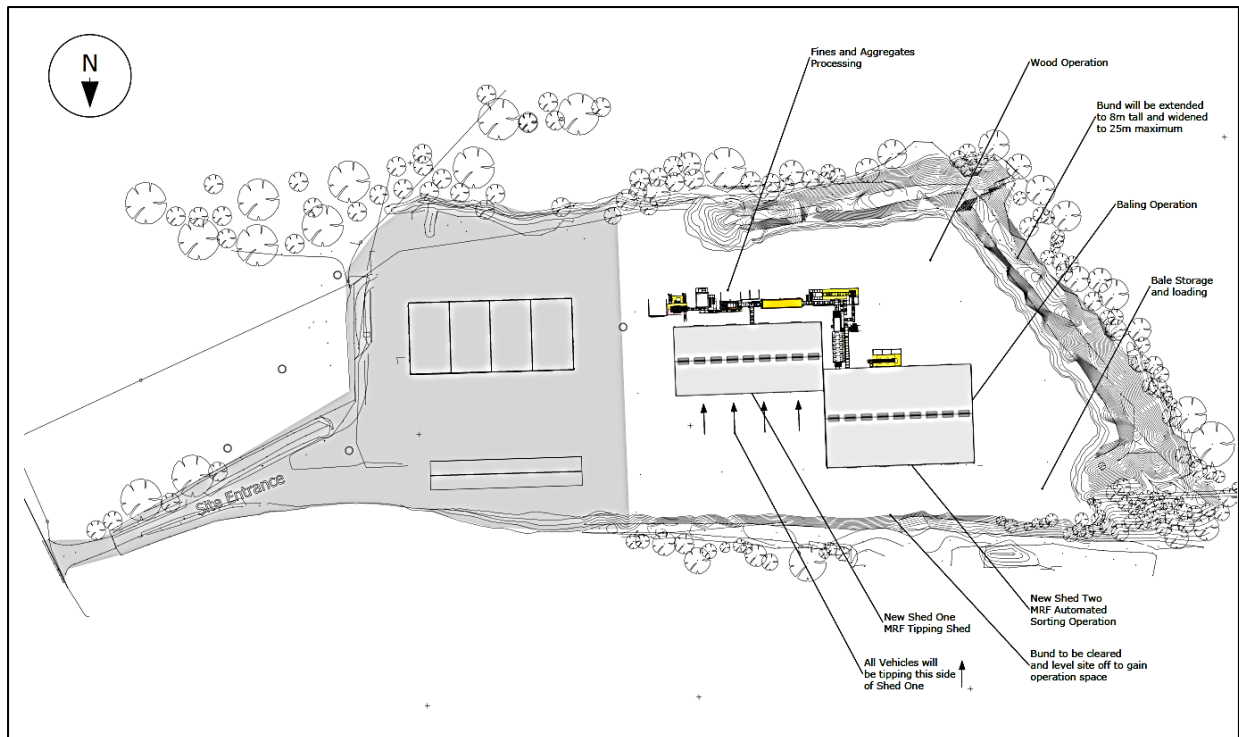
proposed site layout plan set alongside existing waste sheds near site access
